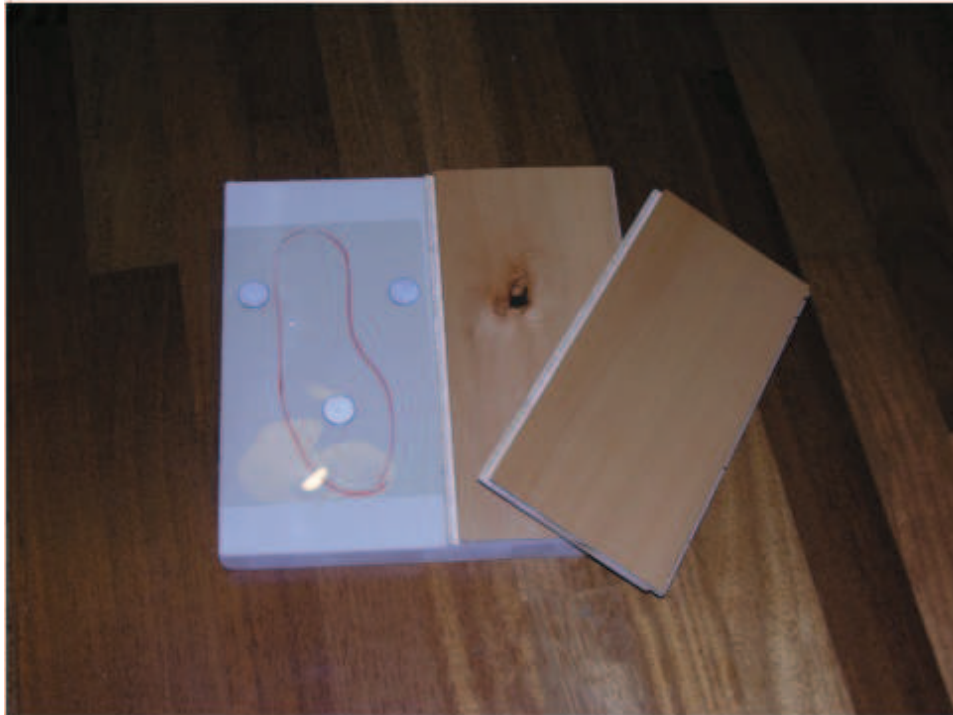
Capacitive sensors on polymeric support installed between solid wood and wooden part of a floating floor.
